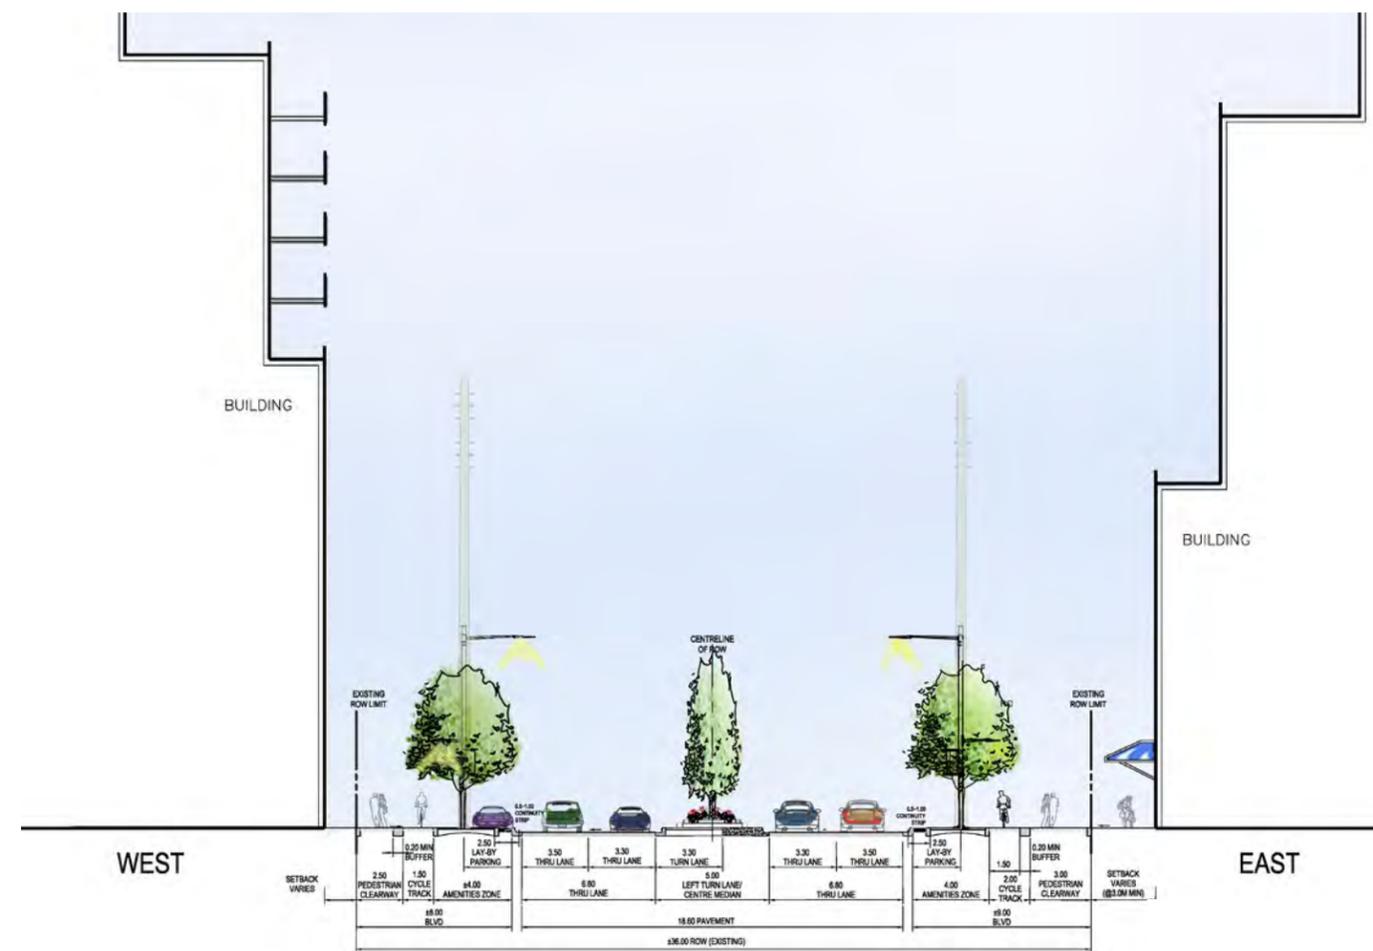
Concept C | Section B-B Steeles Gateway Mid-block
